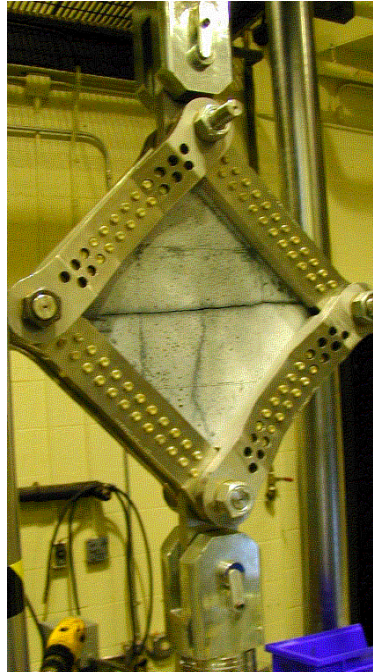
PICTURE FRAME SHEAR ELEMENT TEST SETUP
